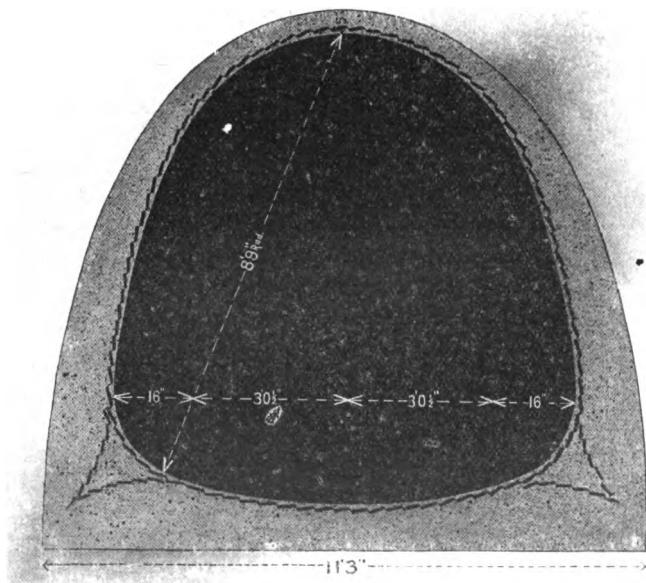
Method of Reinforcing Water Conduit at Boonton, N. J.
